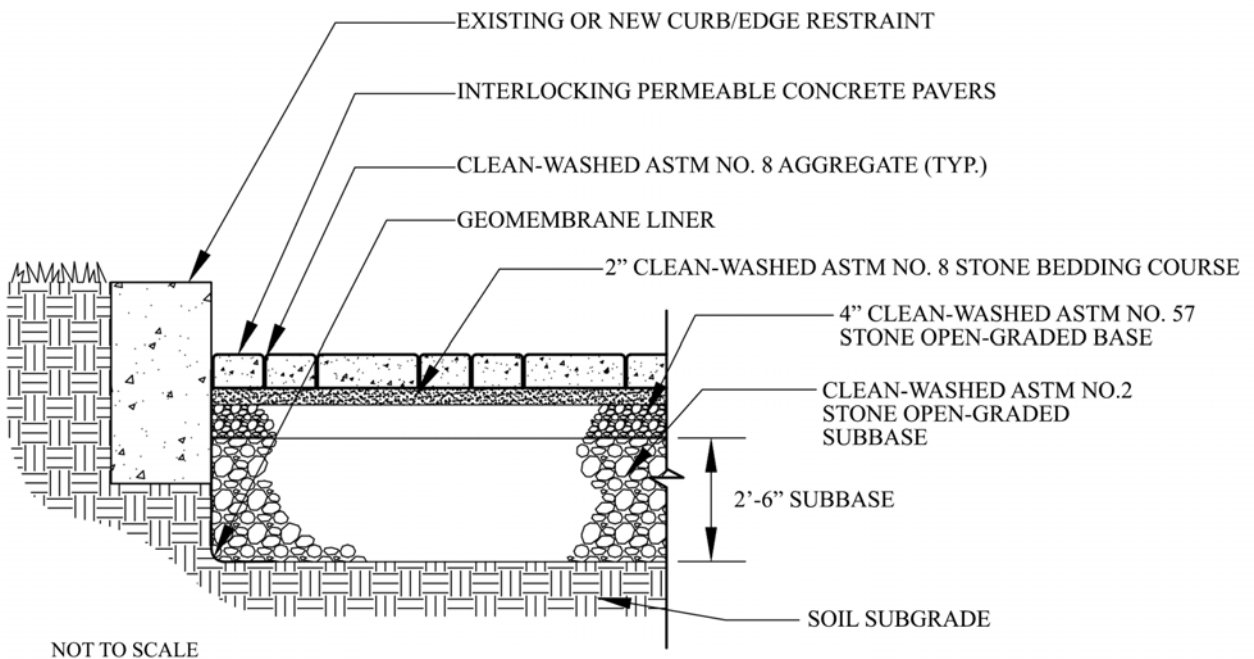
Permeable Paver Section Detail, *image by Author.
